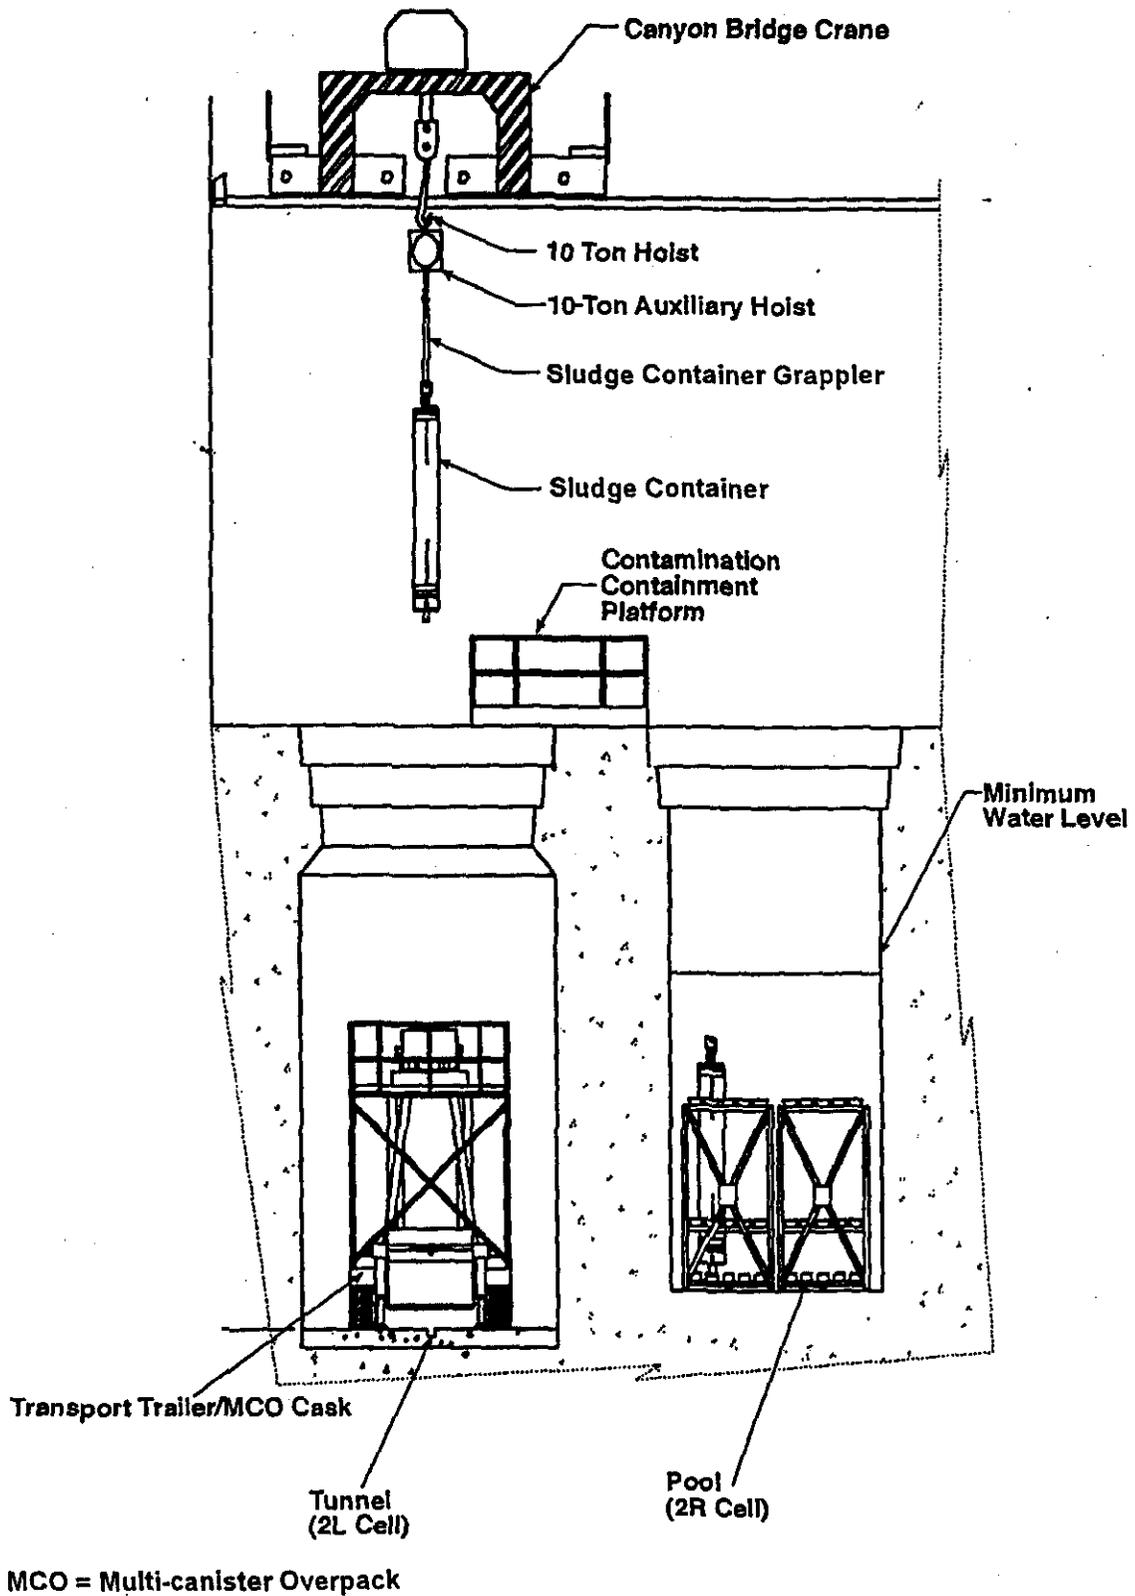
271-T Building and 221-T Building Second Floor Cell Layout.
